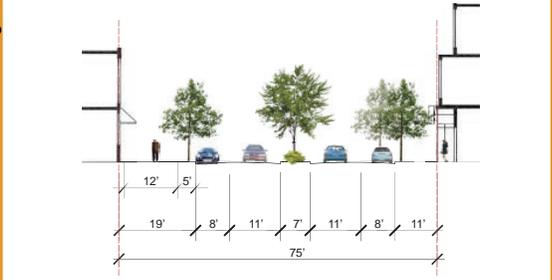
Section through Santa Cruz Avenue, showing two traffic lanes with parallel parking, median trees retained, diagonal parking removed, one moderately-sized sidewalk and one wide sidewalk.
